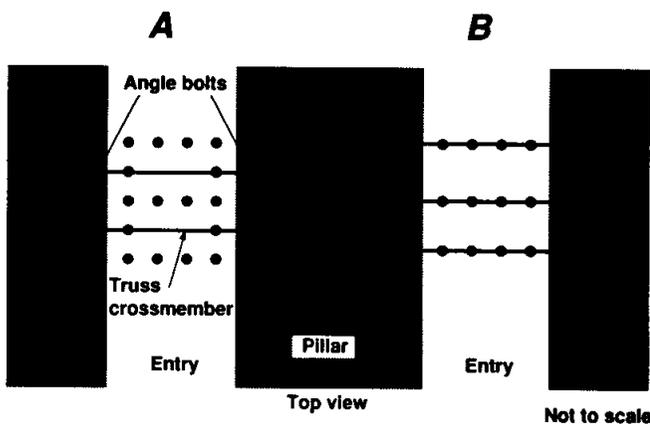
Primary and supplemental support installation practices. A, Use of roof truss for supplemental support; B, on-cycle installation of angle bolt portion of truss that combines primary and supplemental roof control plans. [After Hill (27).]
